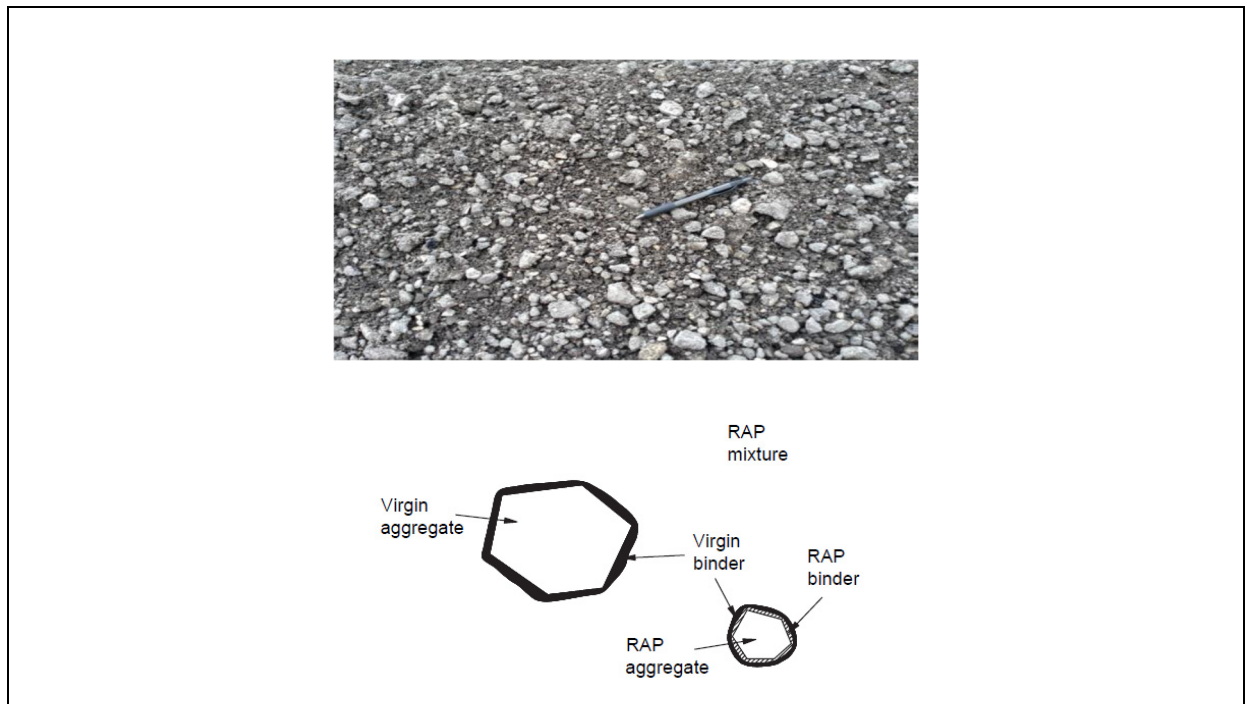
Reclaimed asphalt pavement and its schematic material mixture (RA)
